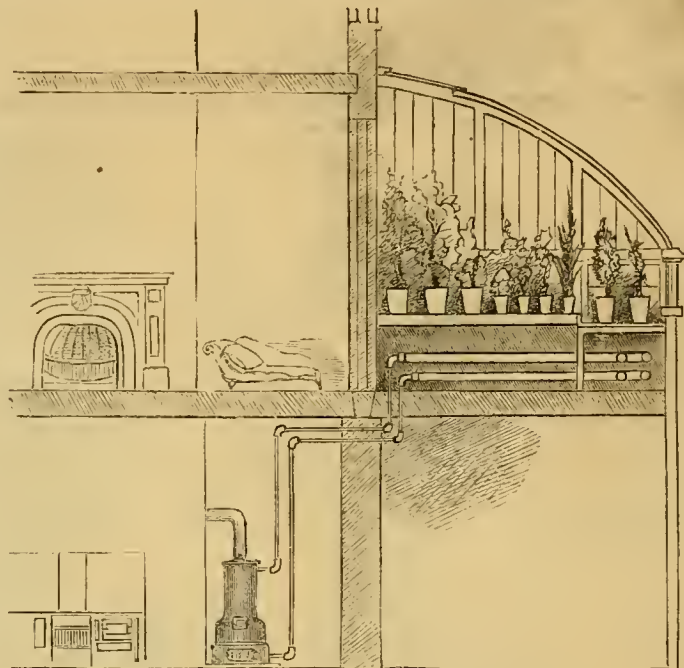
SECTION OF HOUSE AND CONSERVATORY.
